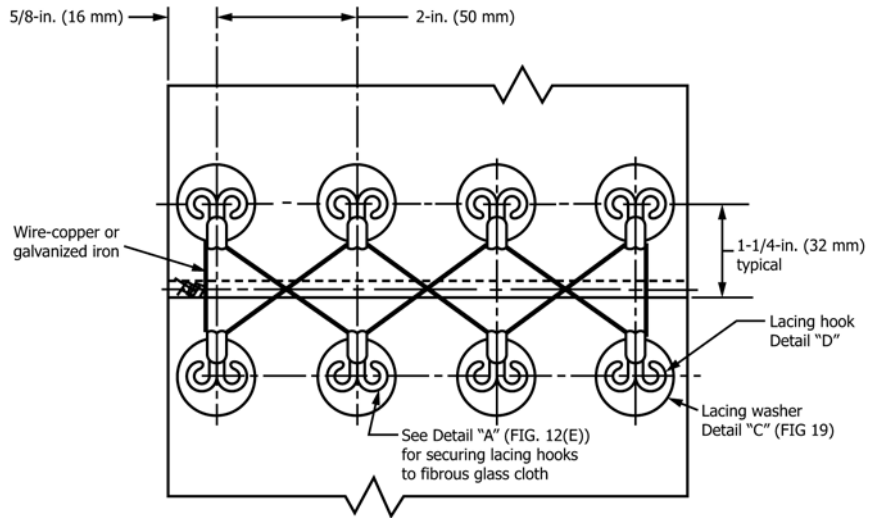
Typical Method of Lacing Removable/Reusable Blankets Using Lacing Hooks
